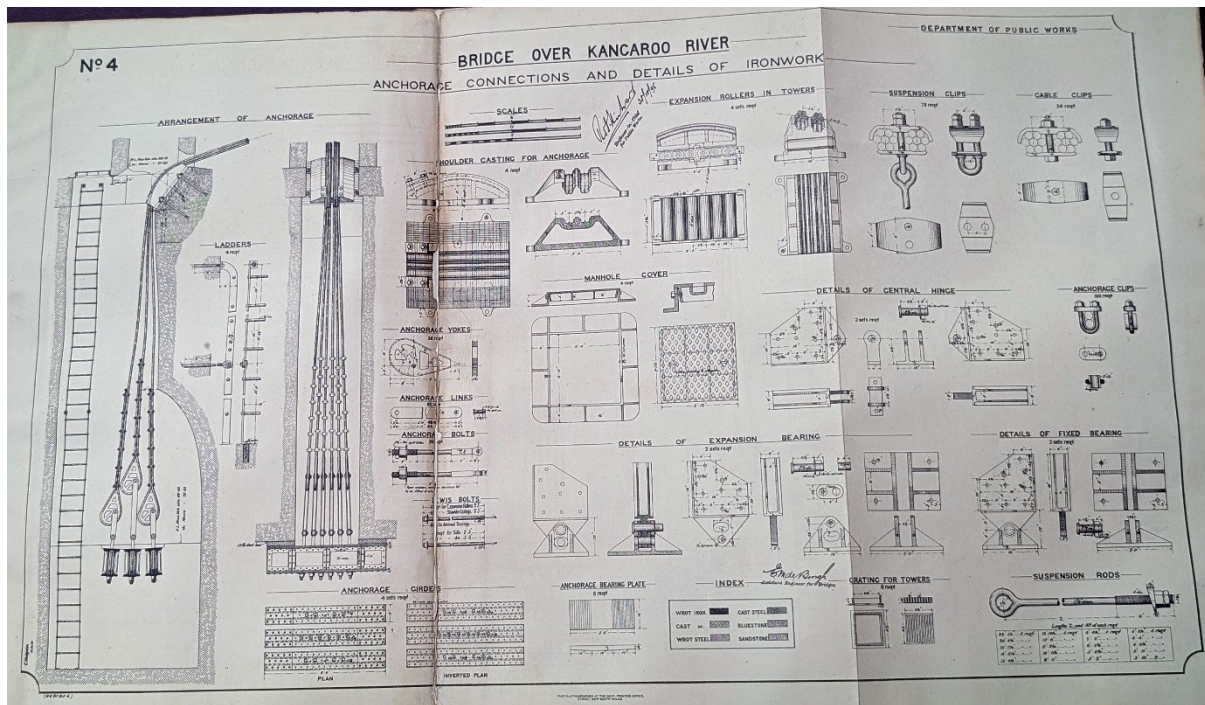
Anchorage Connections and Details of Ironwork, 1895 (Mitchell Library, Q624.23/1 – Sheet No. 4) Dovetailed anchorage girders cut 24 ft into solid rock, expansion rollers in towers, suspension clips – the “umbrella spokes” of 1897.
